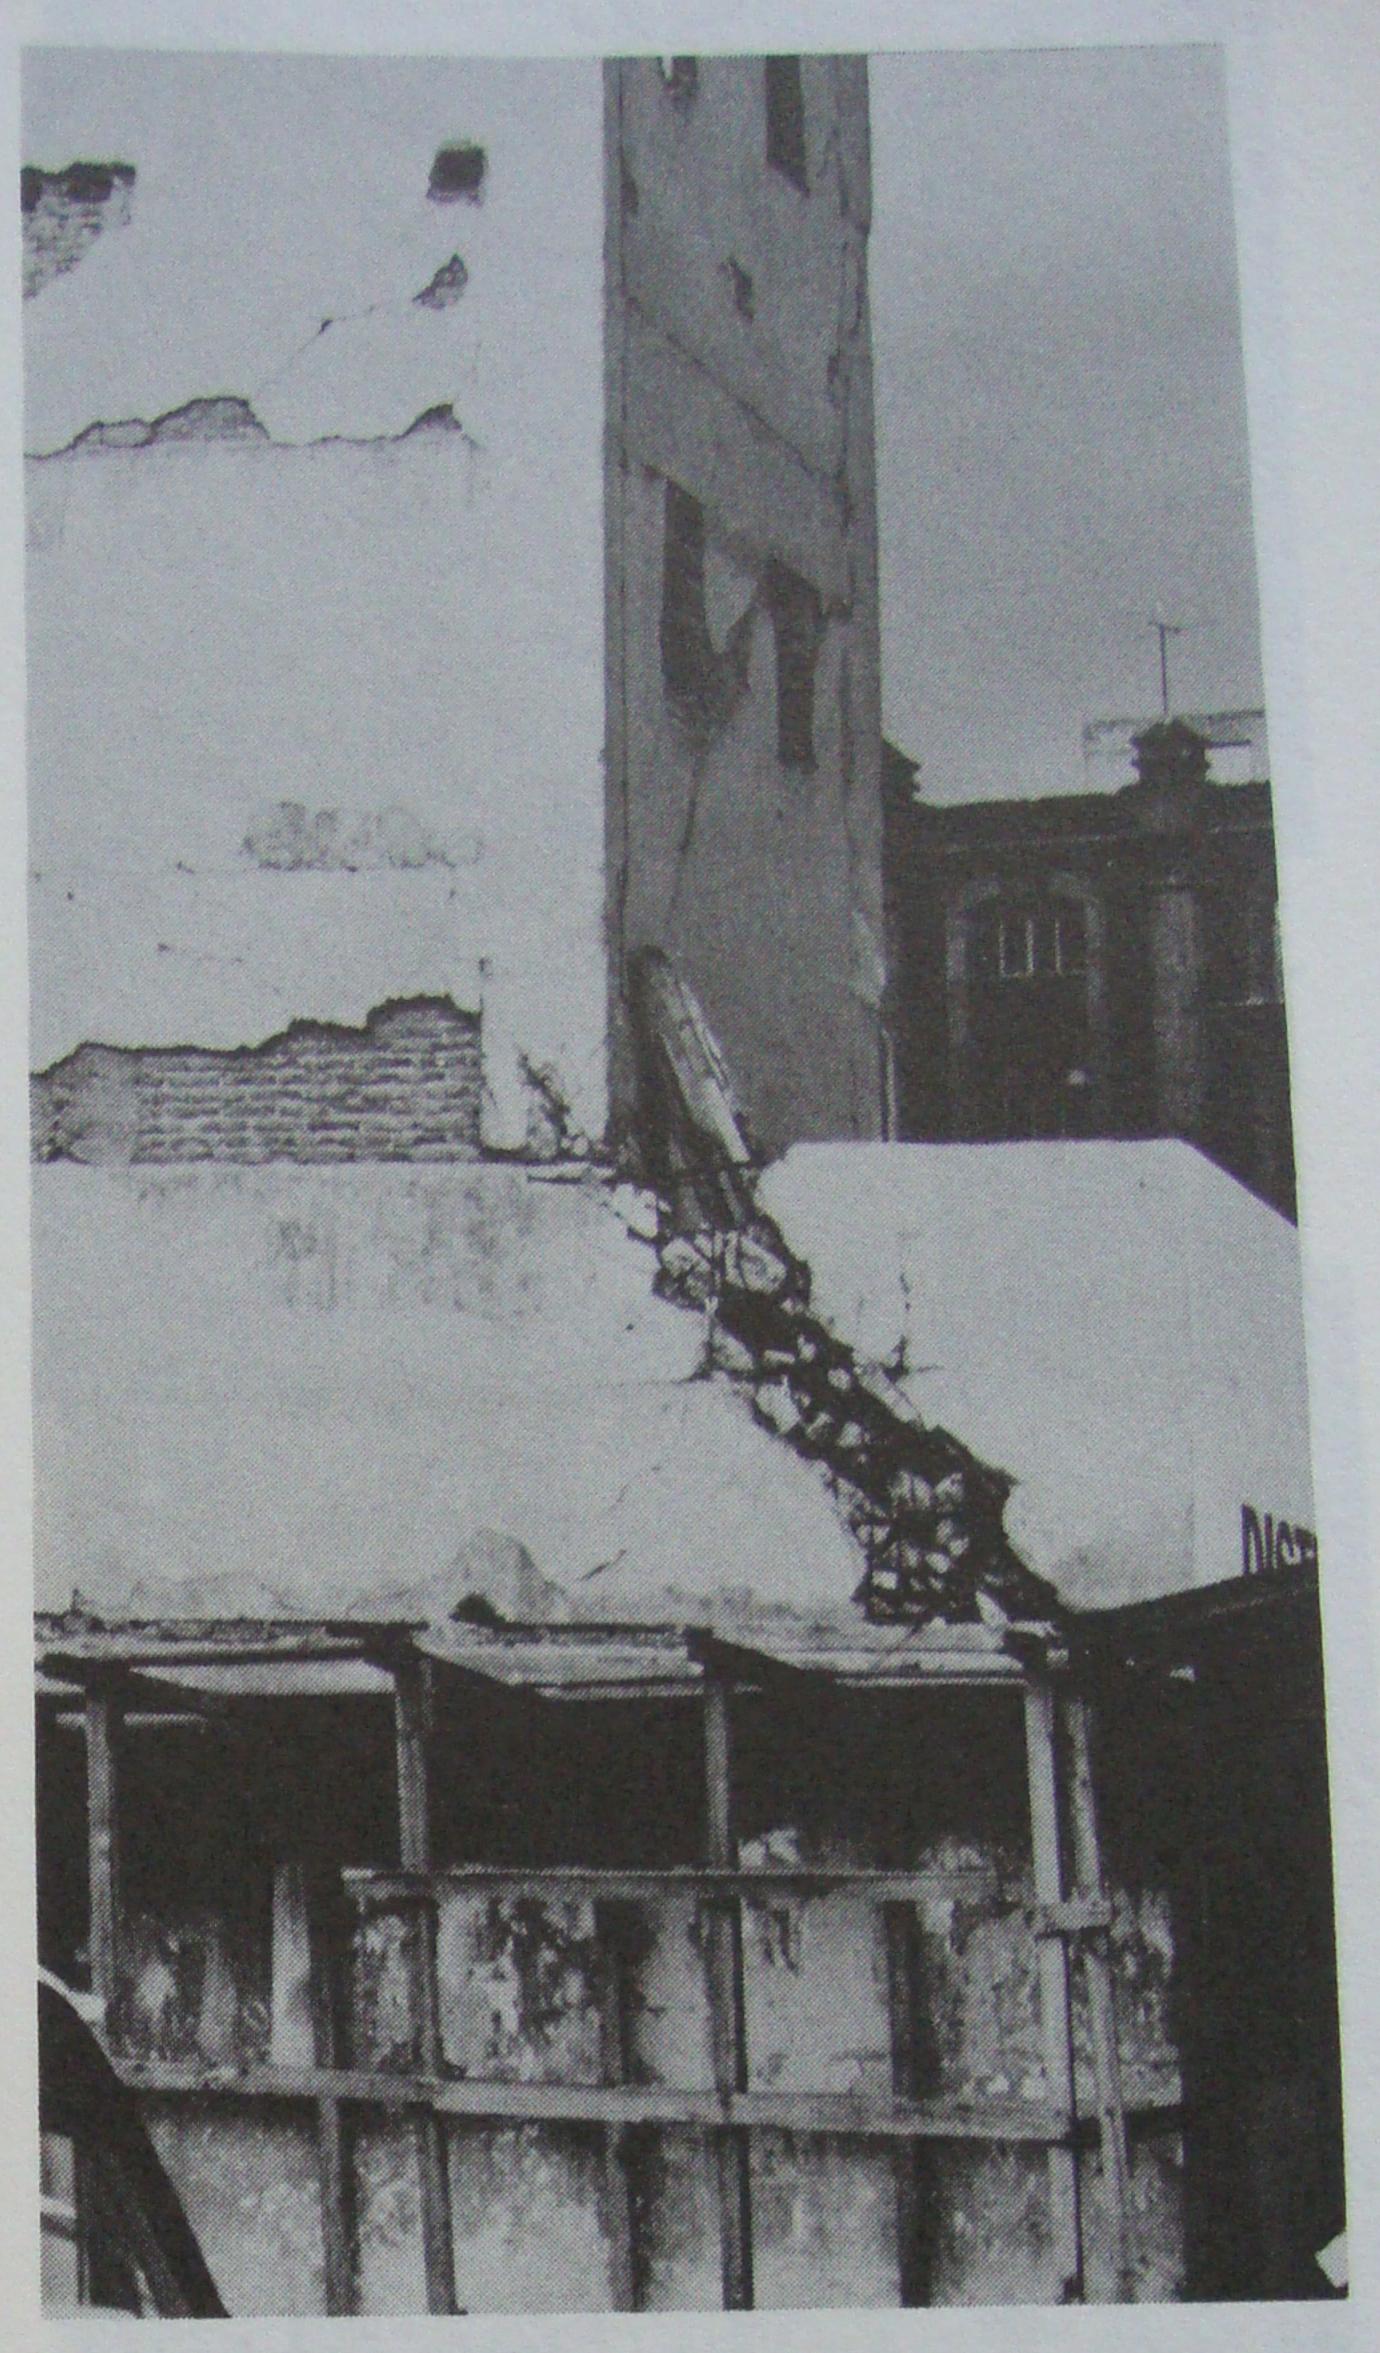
Shear failure of transfer girder in 13 storey structure.
